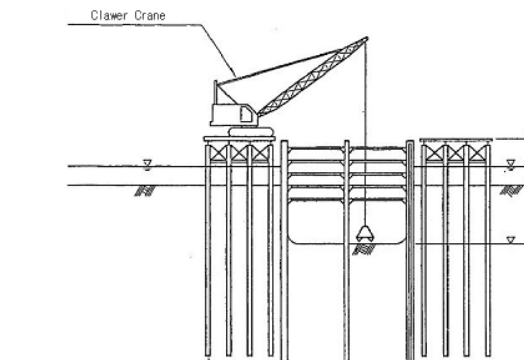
Construction of In-River SPSP Foundation of Nguyen Trai Bridge
